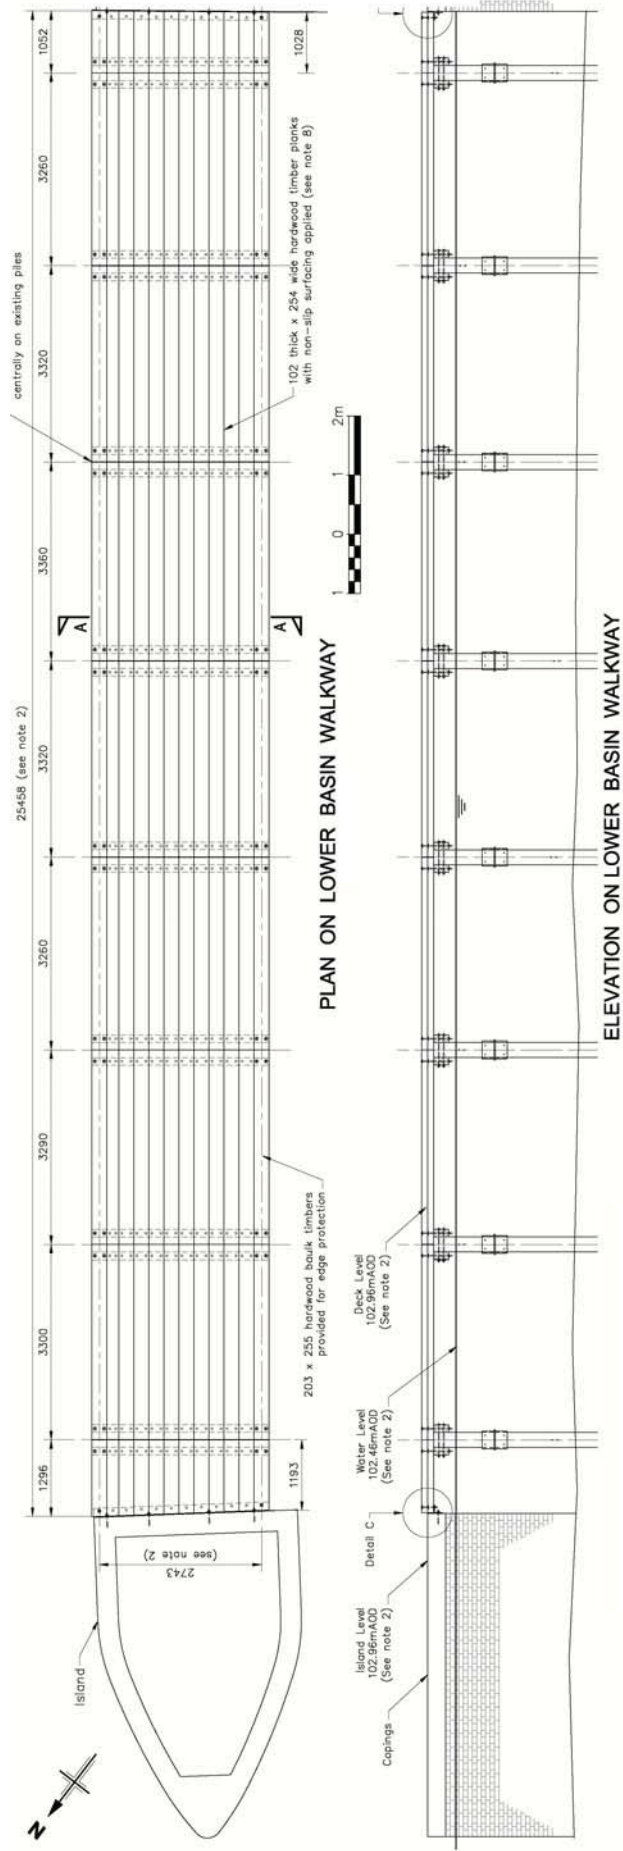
Plan and elevation of proposed reconstructed walkway (from WNCAX-091-16). (Appendix 1)
